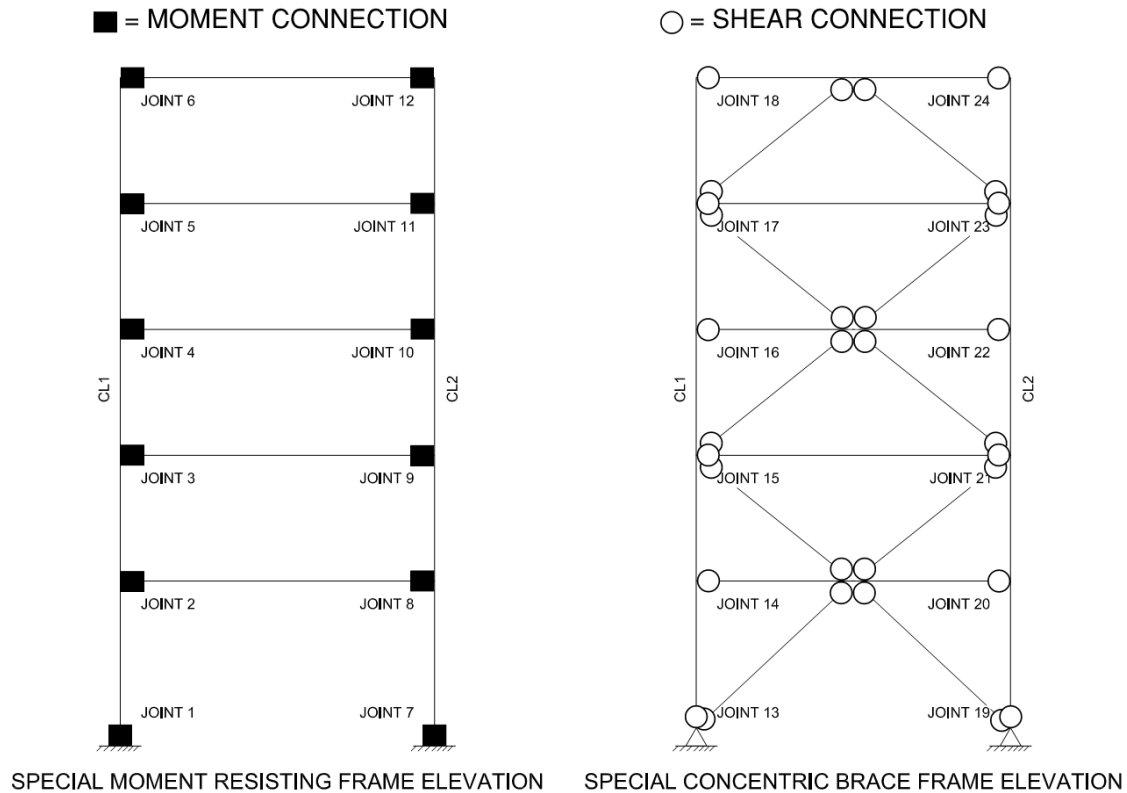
Frame Elevations with Joint and Column Labels (Individual System Frames)
